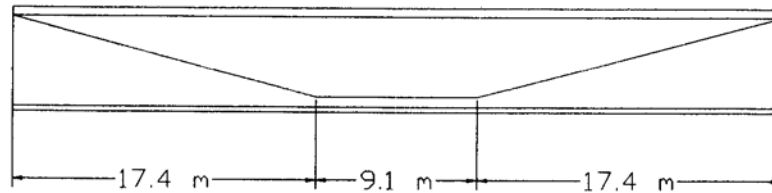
Tendon profile for Modified Type VI girder for Westbound Gandy bridge.
